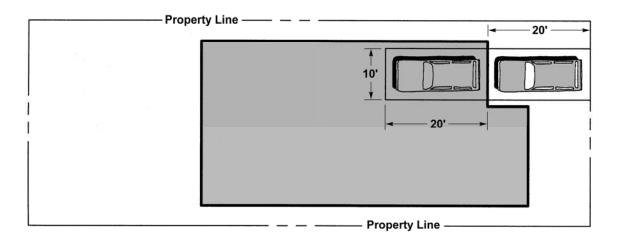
Parking Space Shown in Front Yard Area with Minimum 20' Setback to Building
